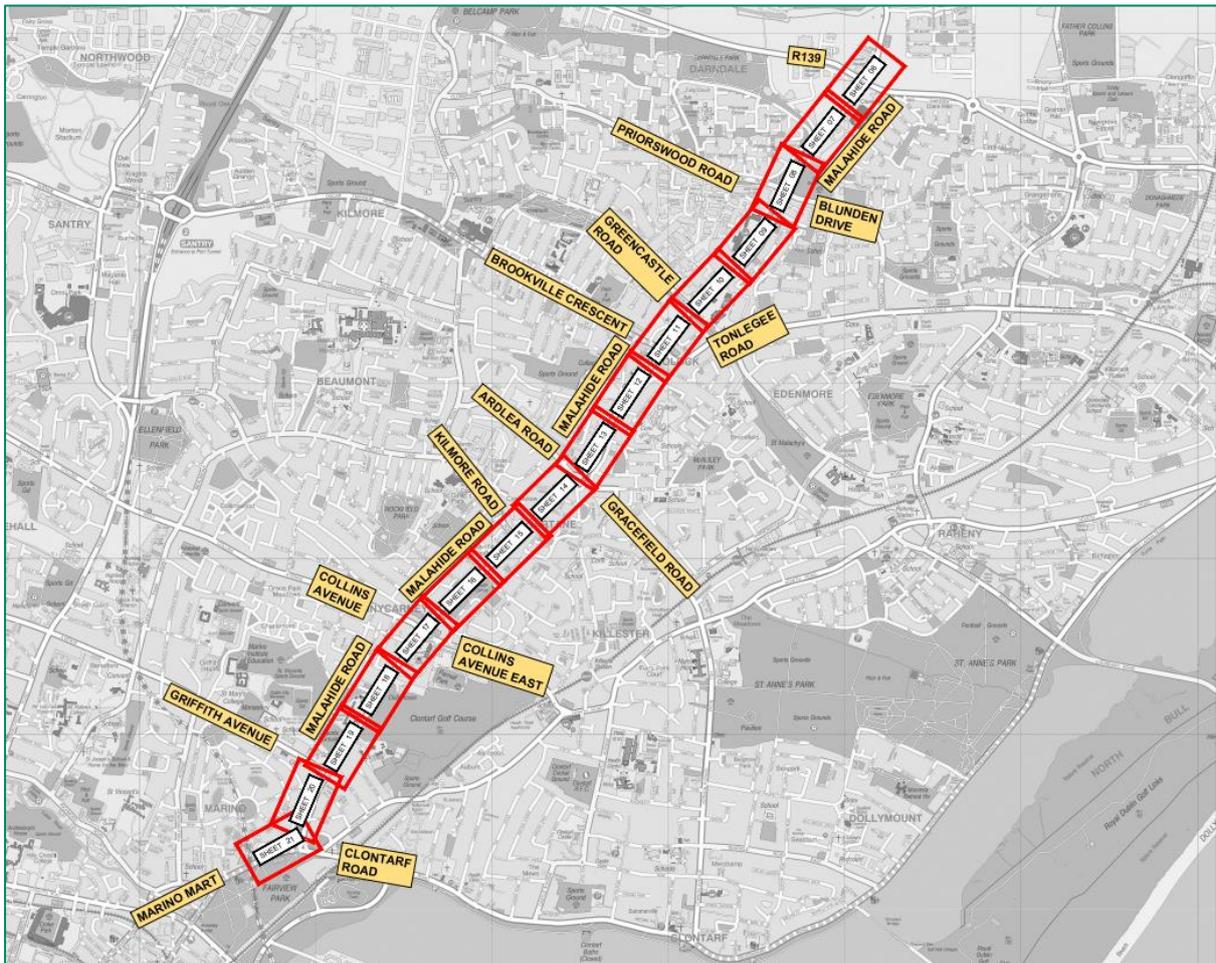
Site Location (Source: General Arrangement - Key Plan, Drawing No. BCIDA-ACM-GEO_KP-0001_XX_00-DR-CE-0001)
